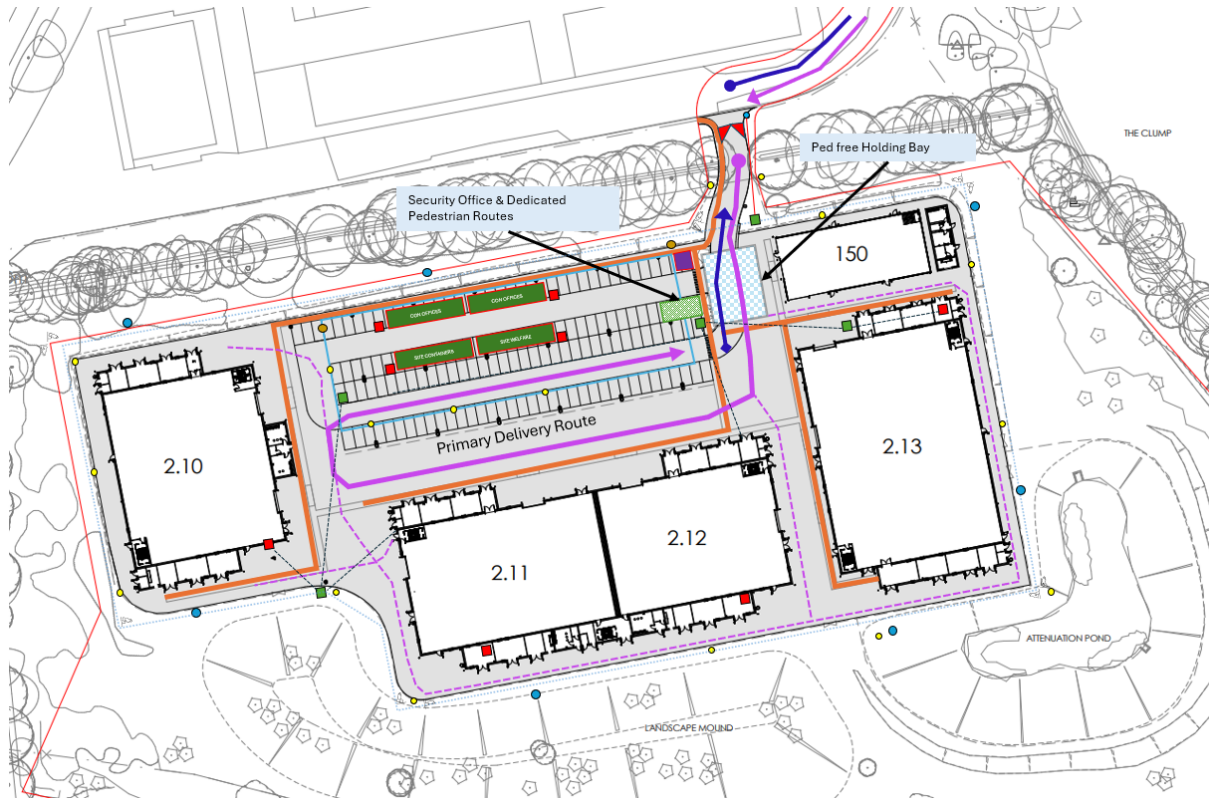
Phase 3 Master Traffic Management Plan (Site Layout)
